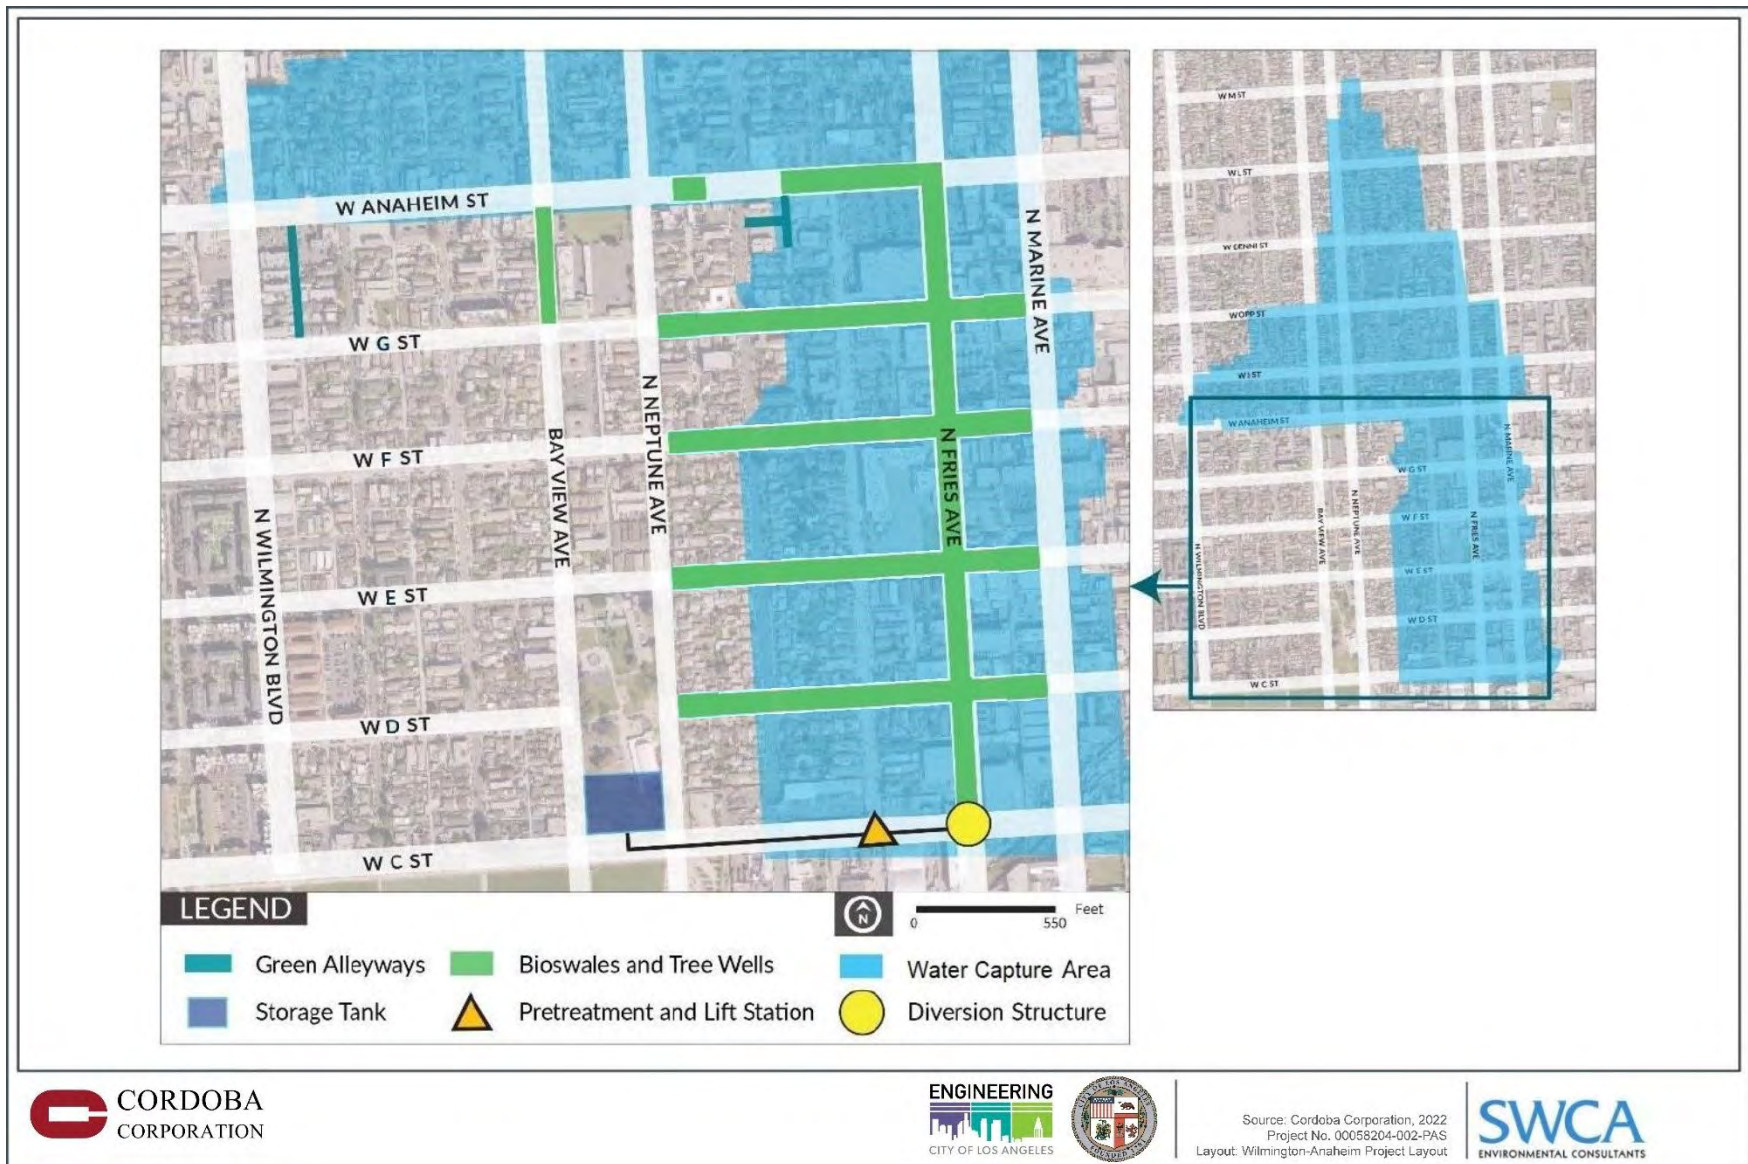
Site plan for the Wilmington-Anaheim Green Infrastructure Corridor Project.
